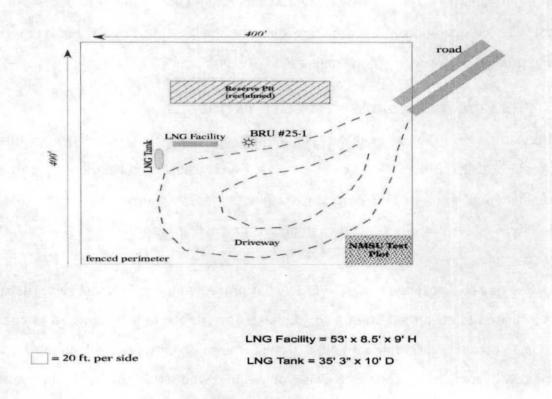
Proposed layout of mini-LNG Facility and storage tank
